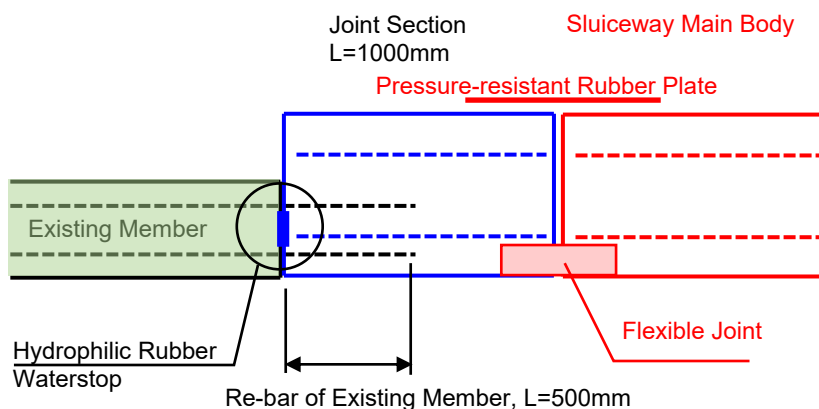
Detail of Connection Between the Existing and New Culvert
